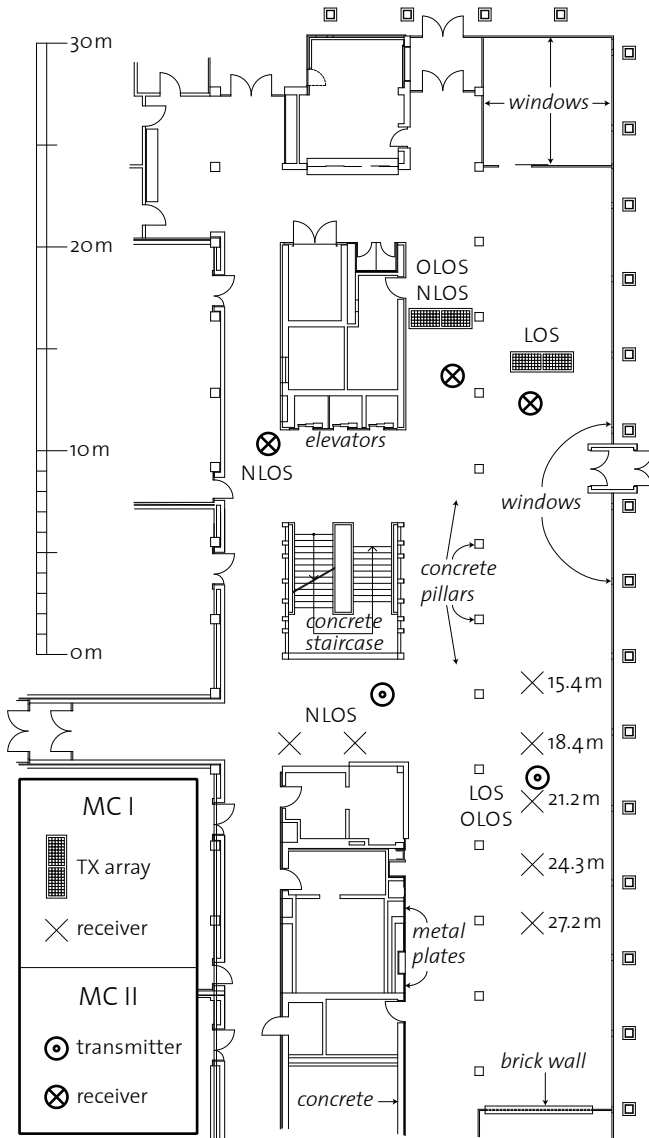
Floor plan of the lobby in the ETZ building, ETH Zurich.
